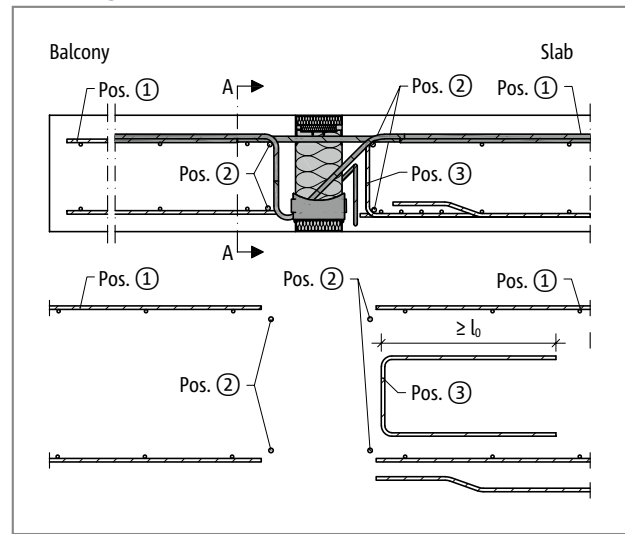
Schöck Isokorb® T type K-E, K-T: On site reinforcement; floor with edge beams
